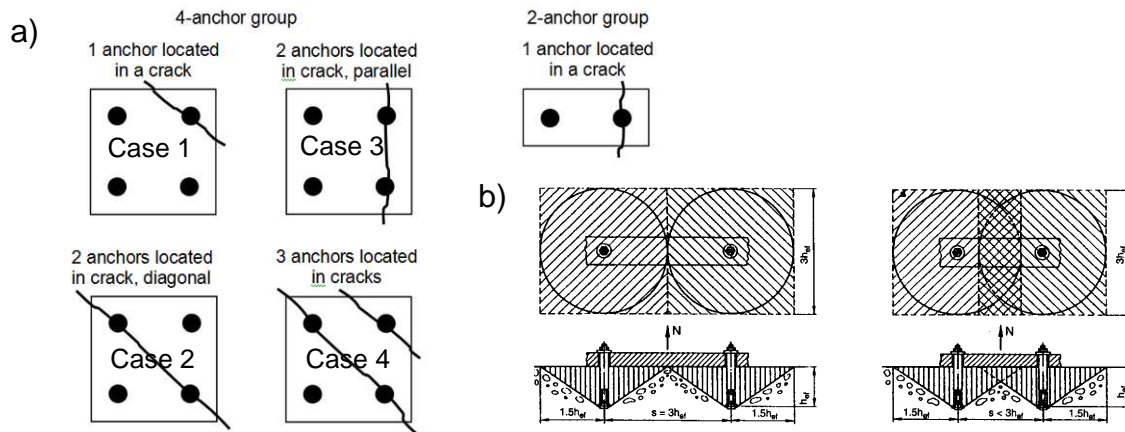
a) Possible crack cases for 4- and 2- anchor groups; b) Large (left) and small (right) anchor spacing (*Elgehausen, R.; Mallée, R. et al. (2006)*)
